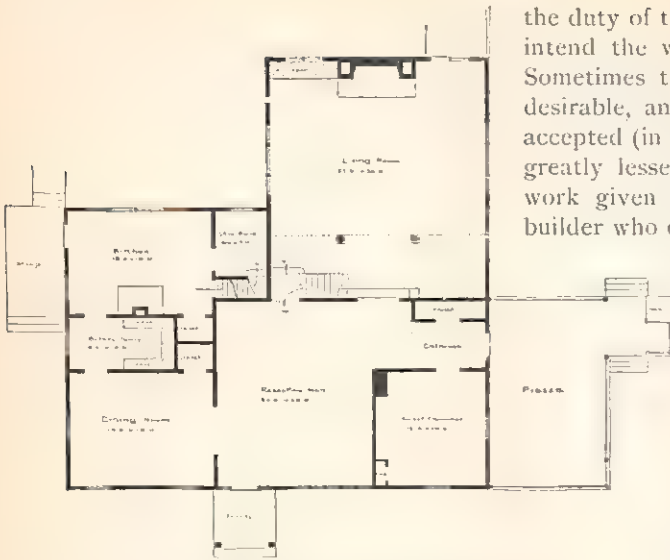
First-floor Plan of House shown in Colored Plate. Designed by Lamb & Rich and built at Bellport, Long Island for \$4,000.
